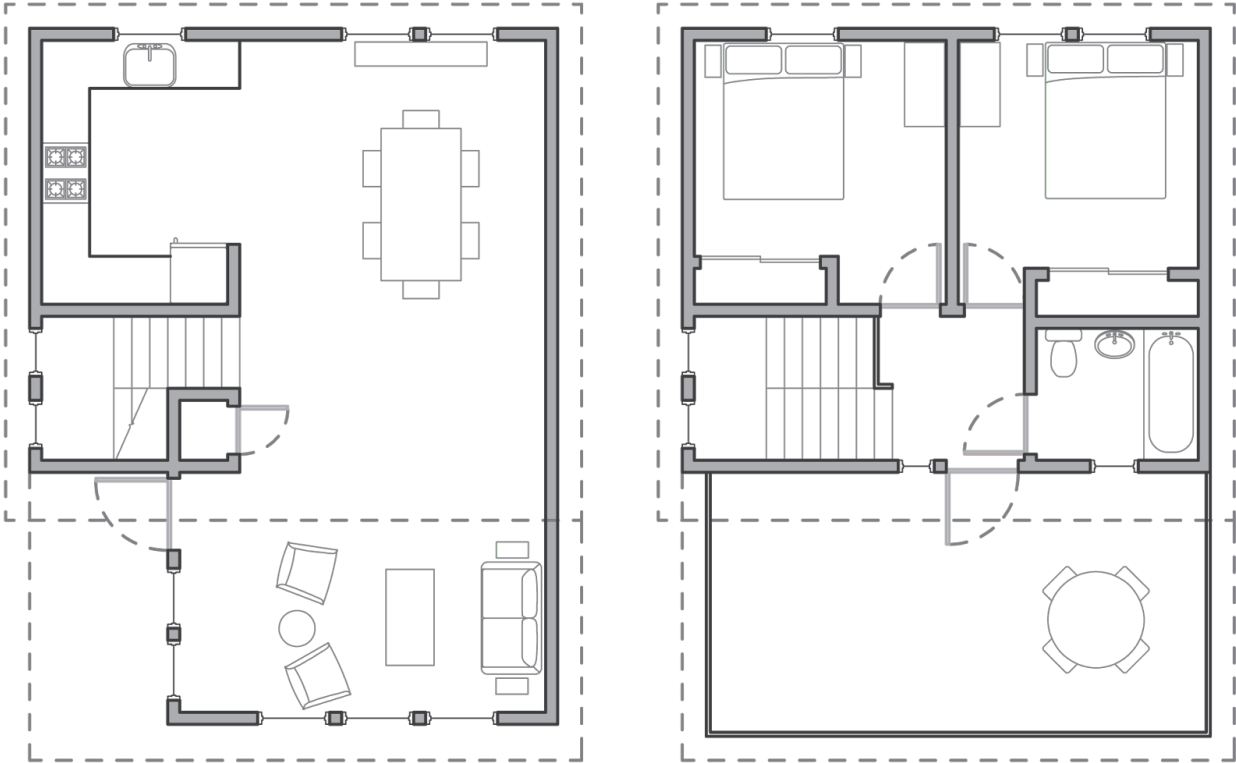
Modern Floor Plans - Ground Floor and Second Floor (Author 2015)
